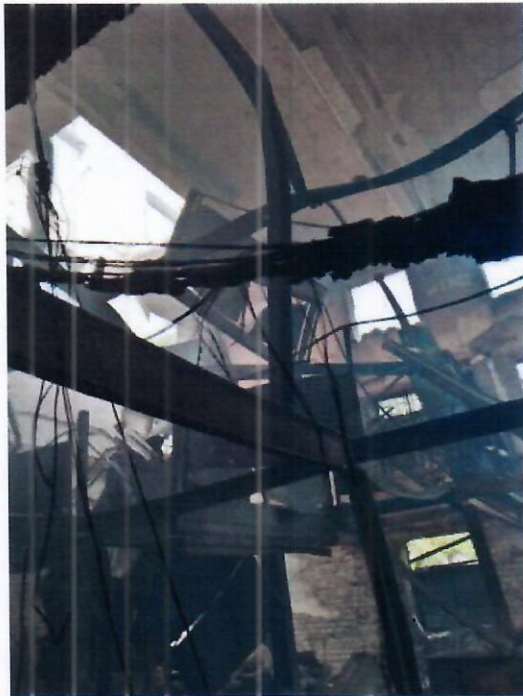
Hanging Metal Conduit, Burnt Trunking and Steel Beams in Southern Wing of Main Building
